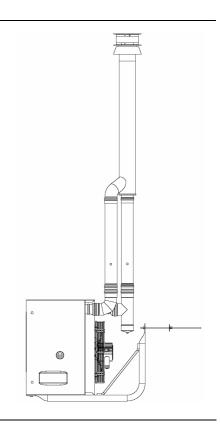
C13 coaxial wall type installation with Ø 130 ducts
